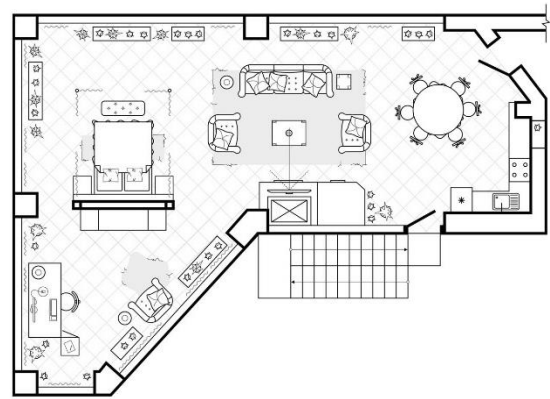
Typical Residential Open plan (Hamilton, 2024)
